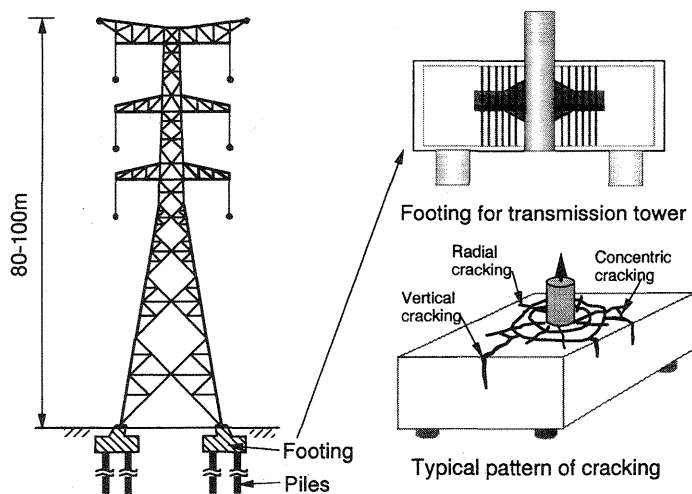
Footing for transmission tower and typical cracking pattern
